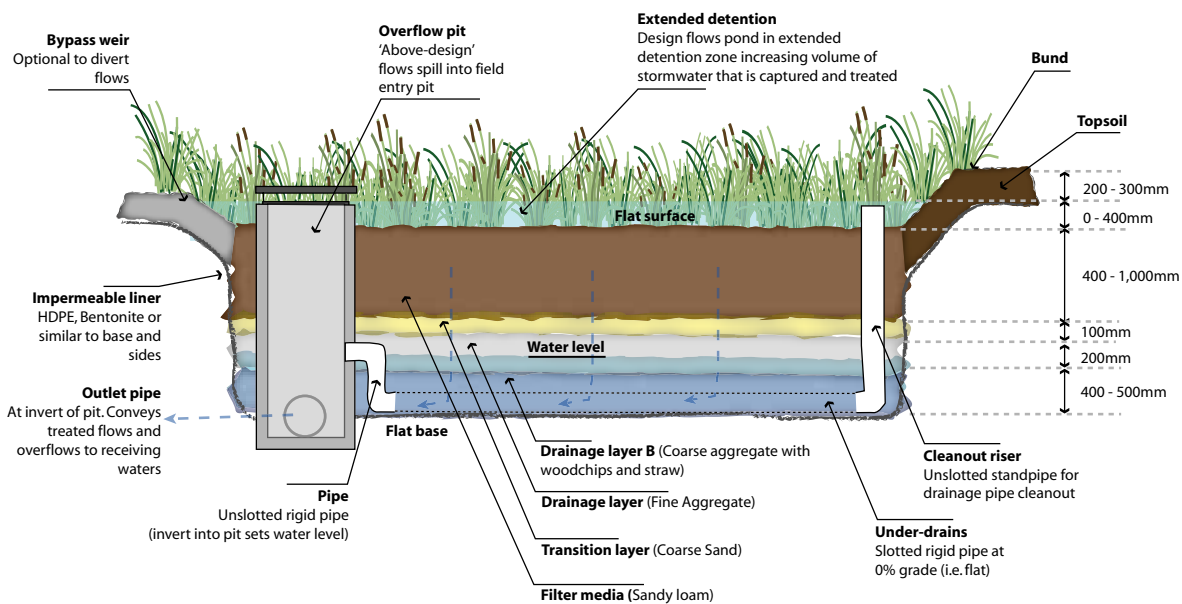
Typical cross-section through a bioretention system with a saturated zone
